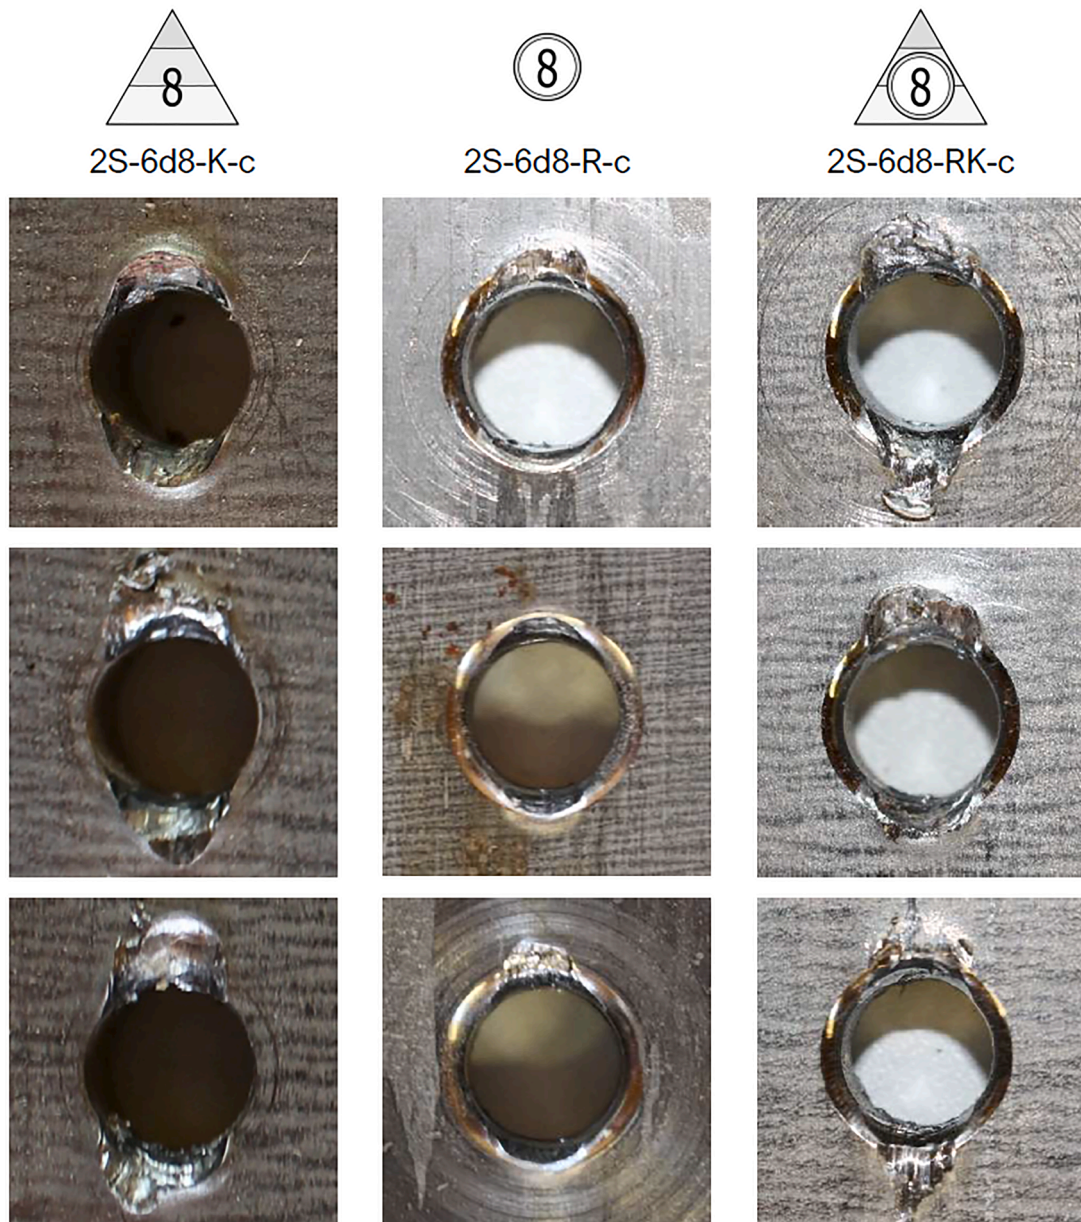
Plate hole edges after the cyclic test. A hole of each specimen is shown.
